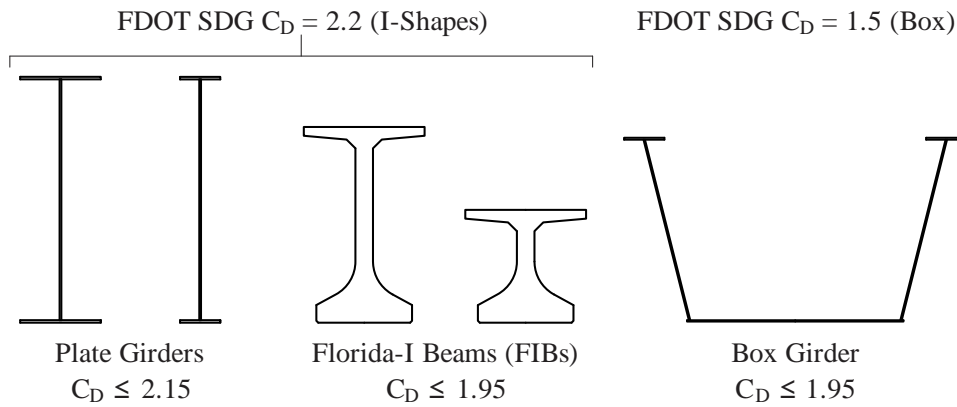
Girder cross-sectional shapes tested in the wind tunnel
